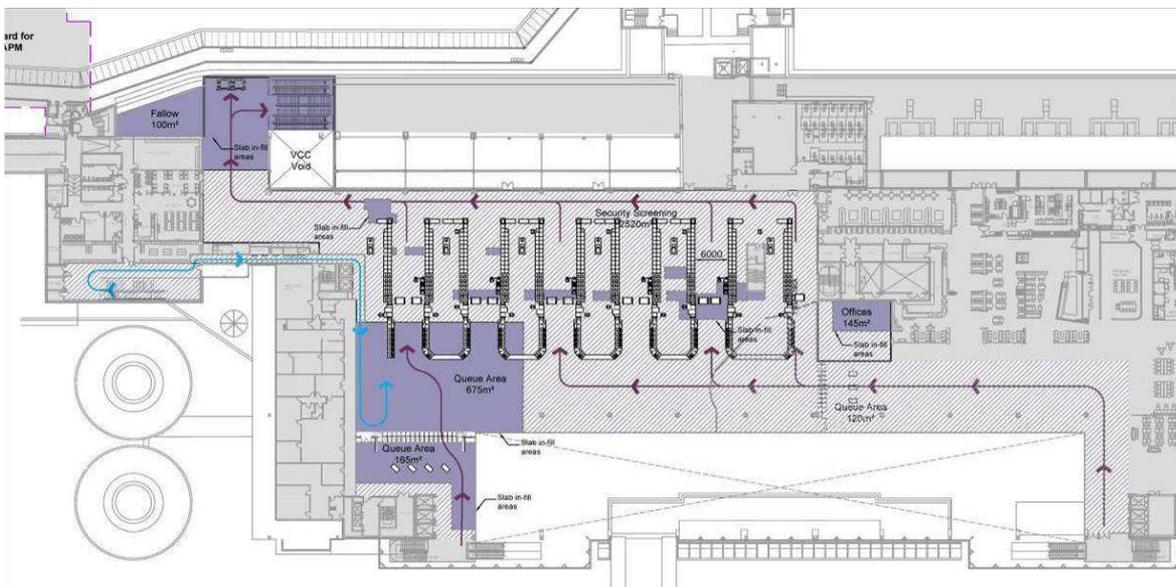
Layout of new proposed CSA at mezzanine level in Terminal 1
